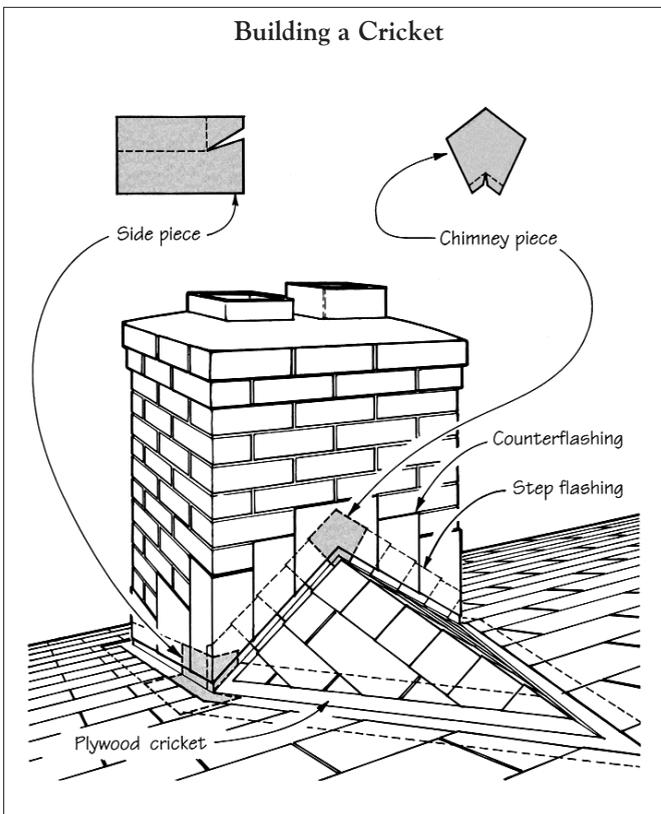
You can build the cricket from plywood and cover it with shingles or metal flashing (for a small chimney). The joint at the cricket is step-flashed and counter-flashed like the rest of the chimney.
